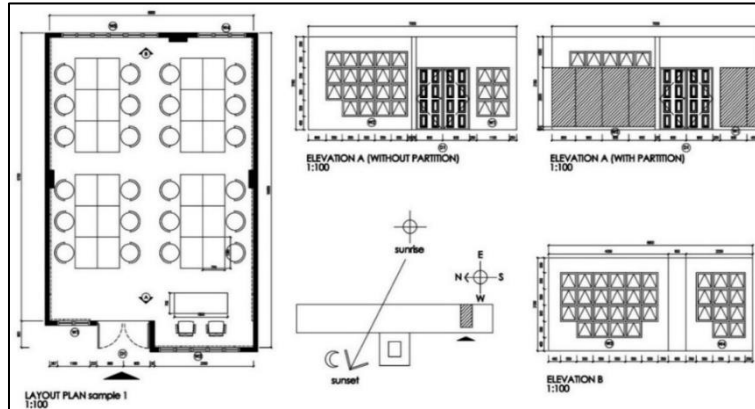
Actual Floor Plan and Elevation Drawing of the Model (Original ES)
